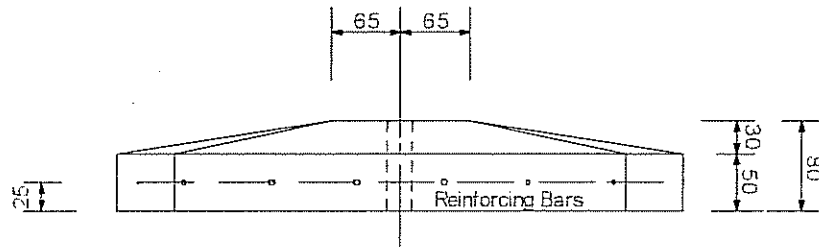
CONCRETE HATARI SLAB TO COVER L.V. CABLES
